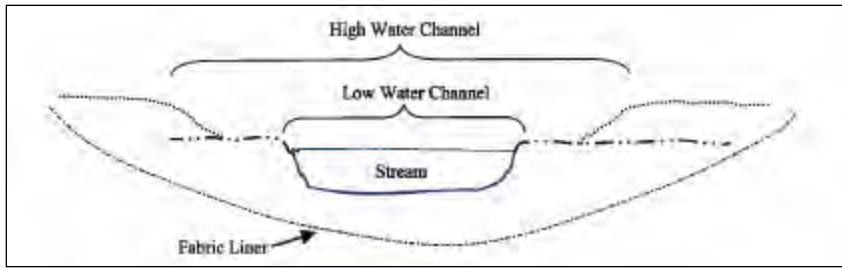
CROSS-SECTIONAL VIEW OF NATURAL BARRIER STABILIZATION.
